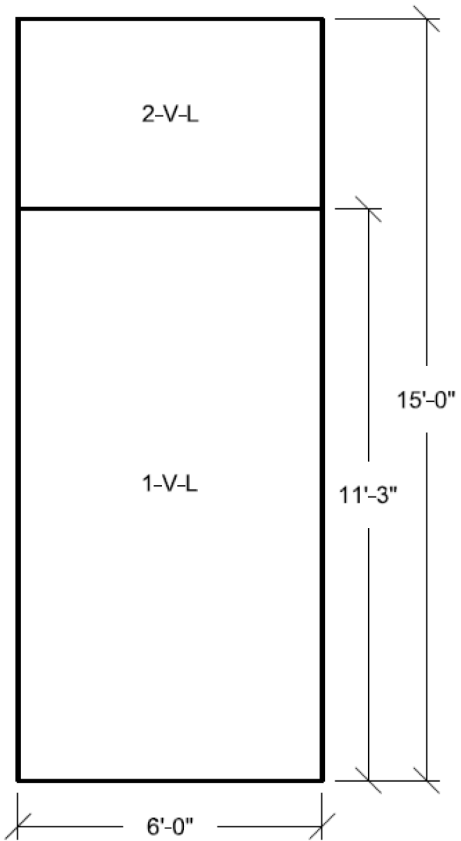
H.6-184 DGFOV Wall 11 Looking From Outside
